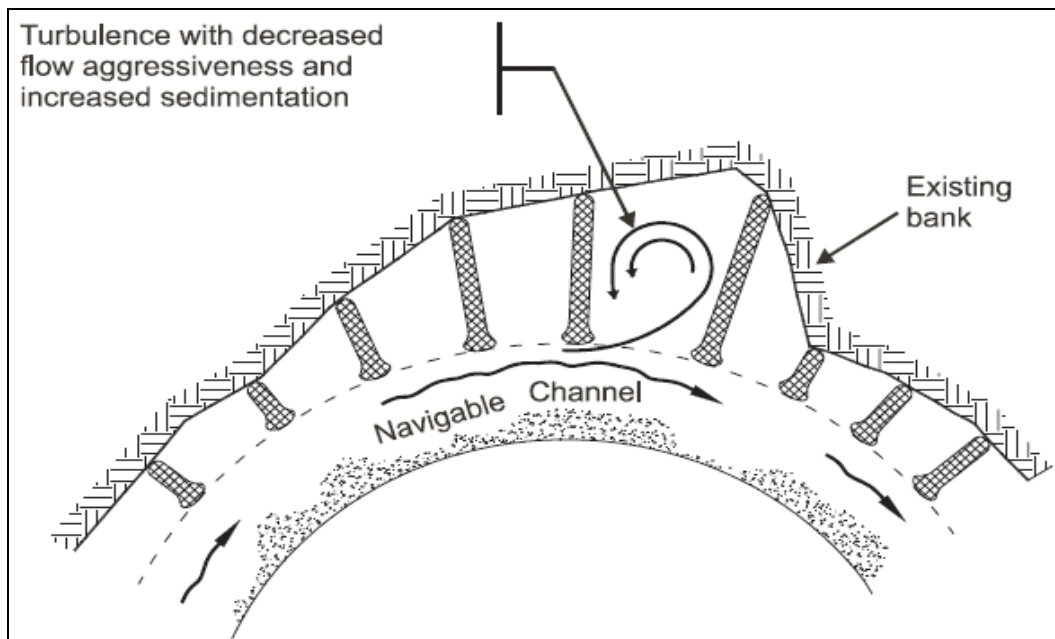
Plan view of system of spur-dikes constructed to control and stabilize the erosion of the outer bank
